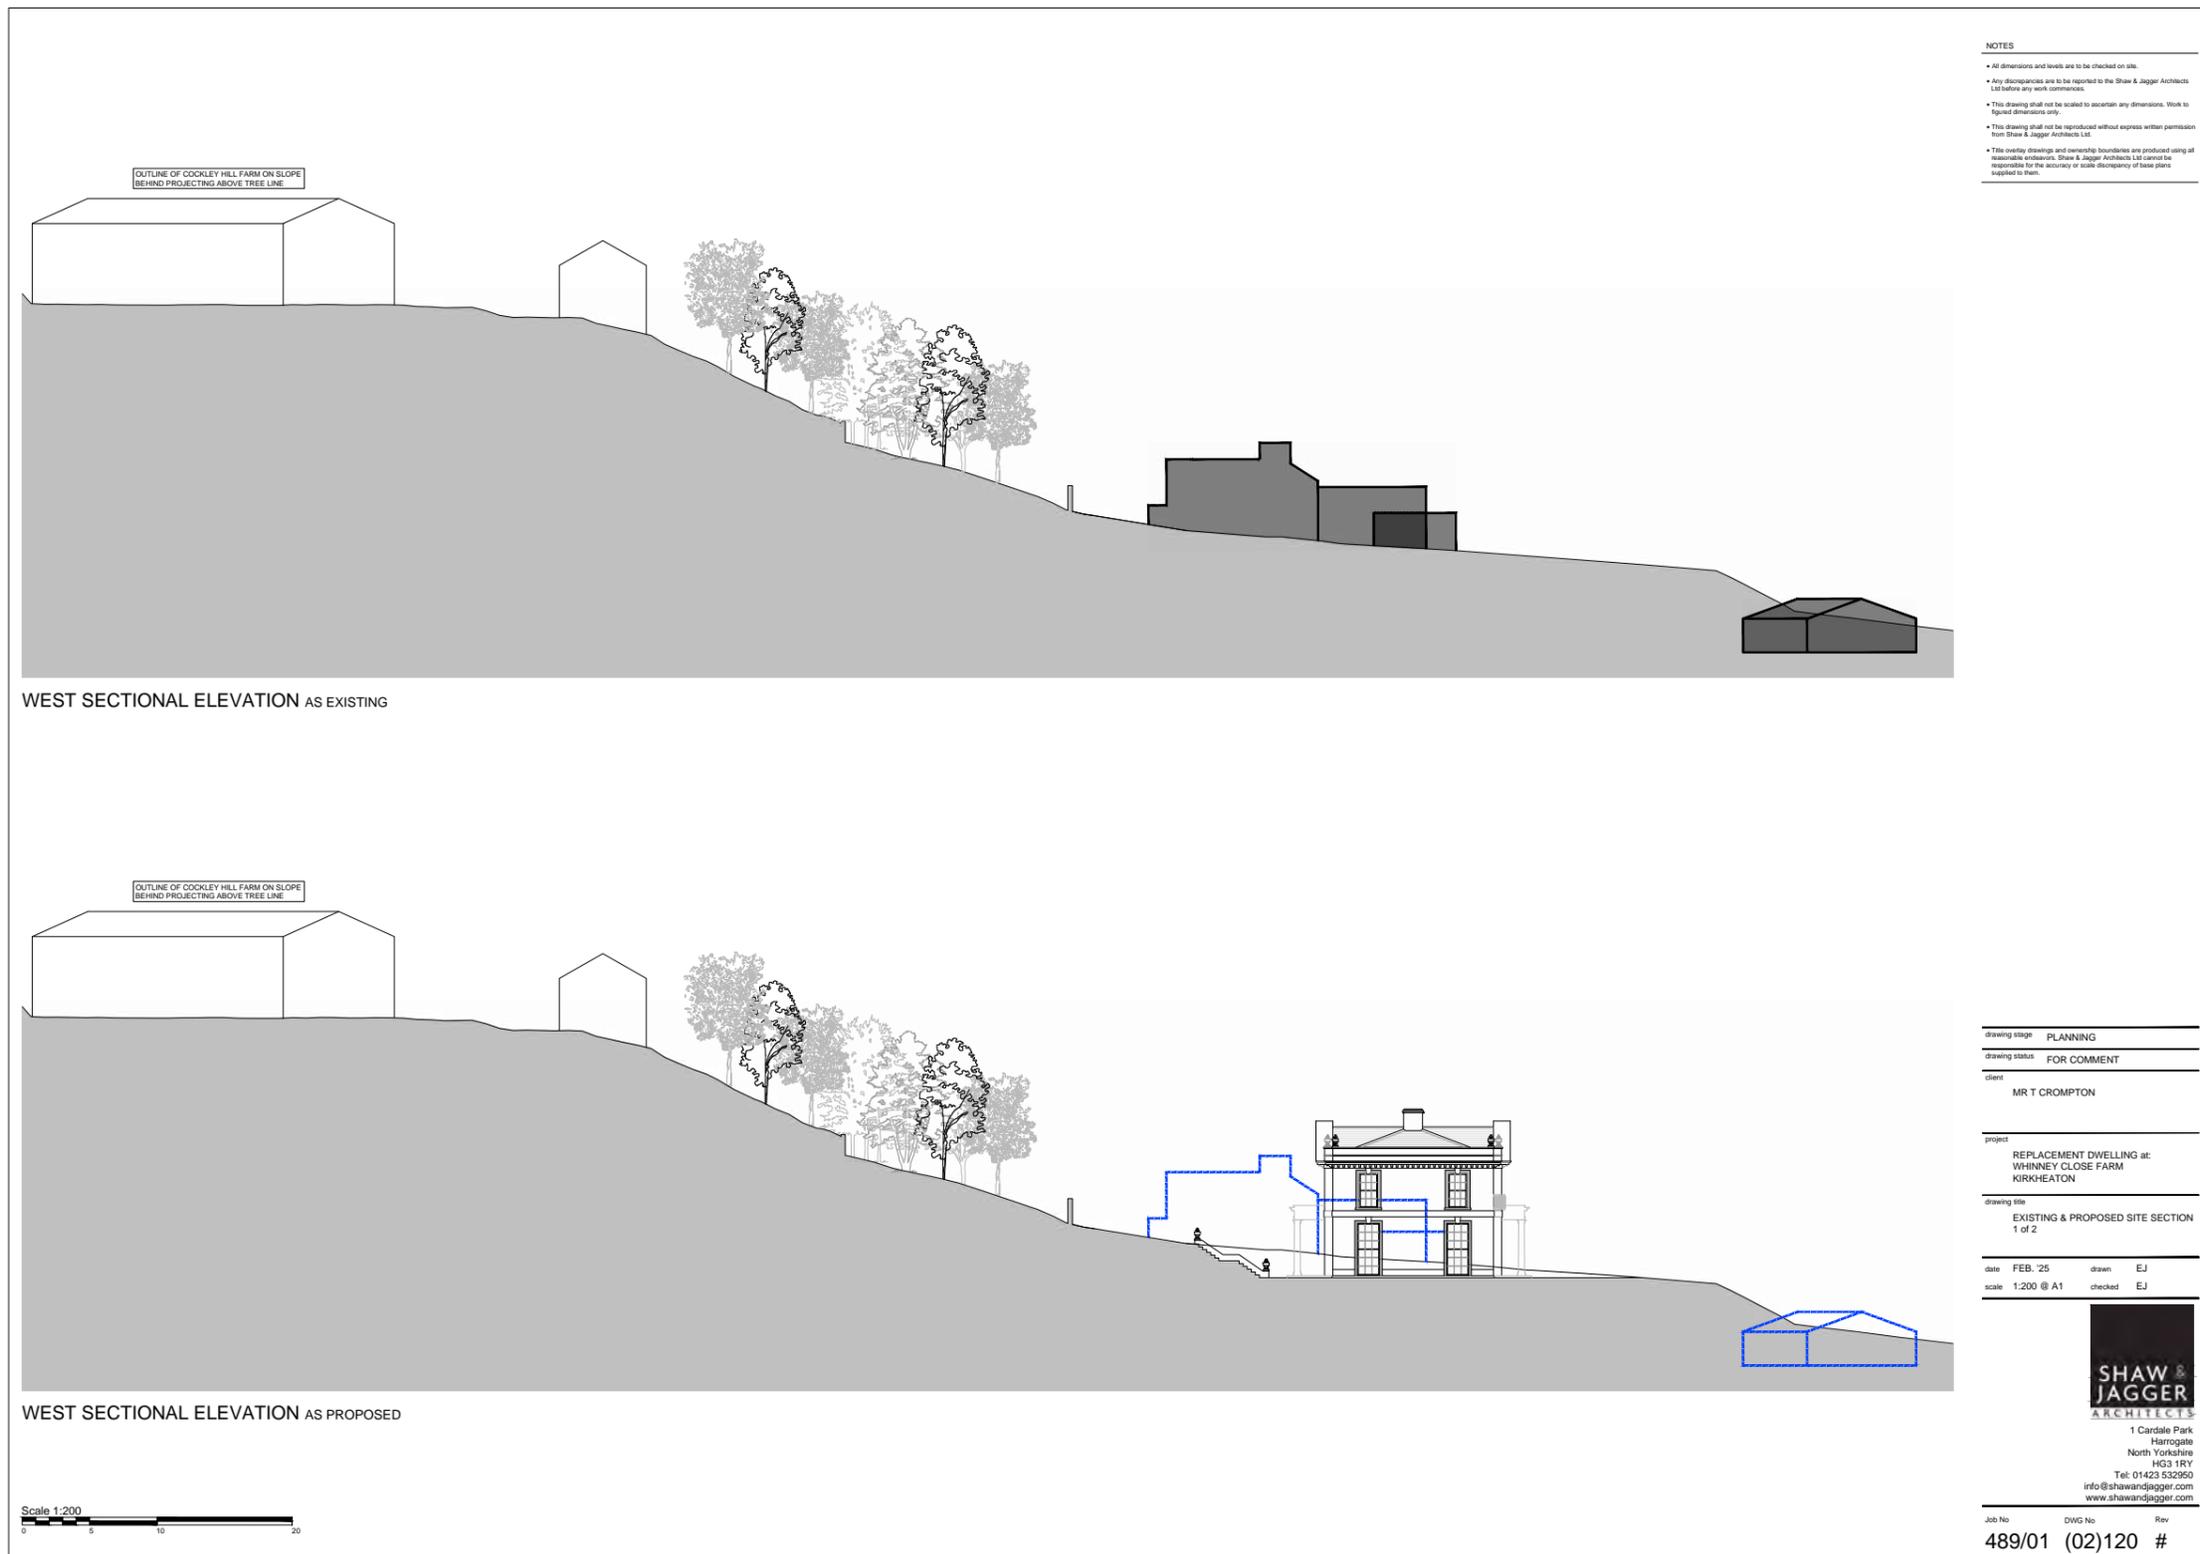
Existing & Proposed West Elevation (Not to scale)
